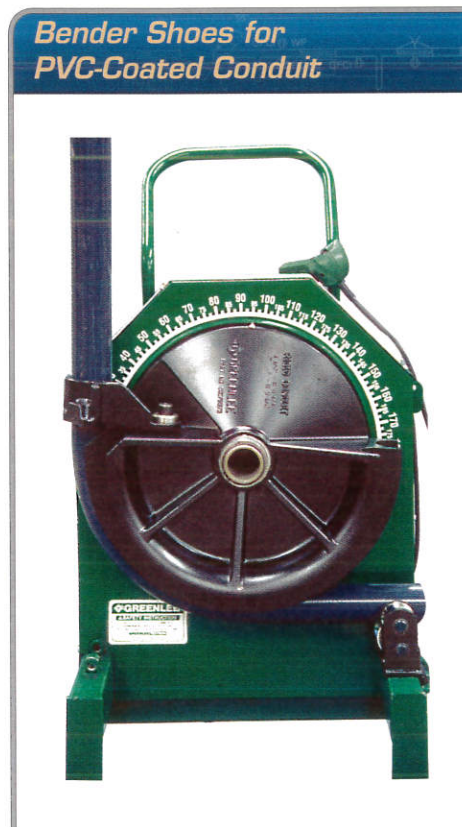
Special bender shoes are required when bending PVC-coated conduit.
